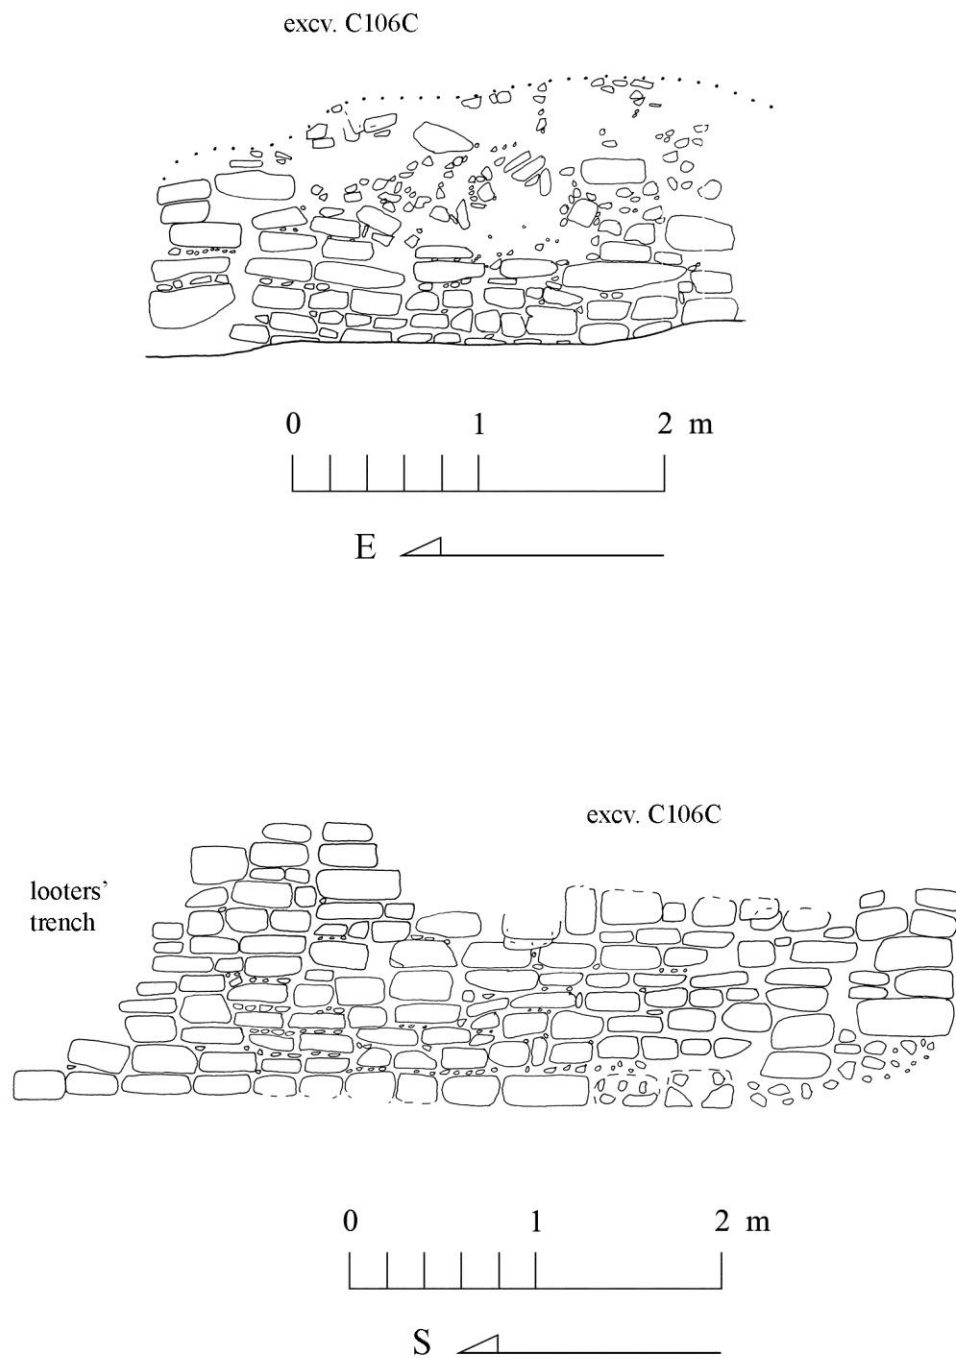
Elevations of wall facings exposed by looters, northeast exterior corner of Structure 4C9.
